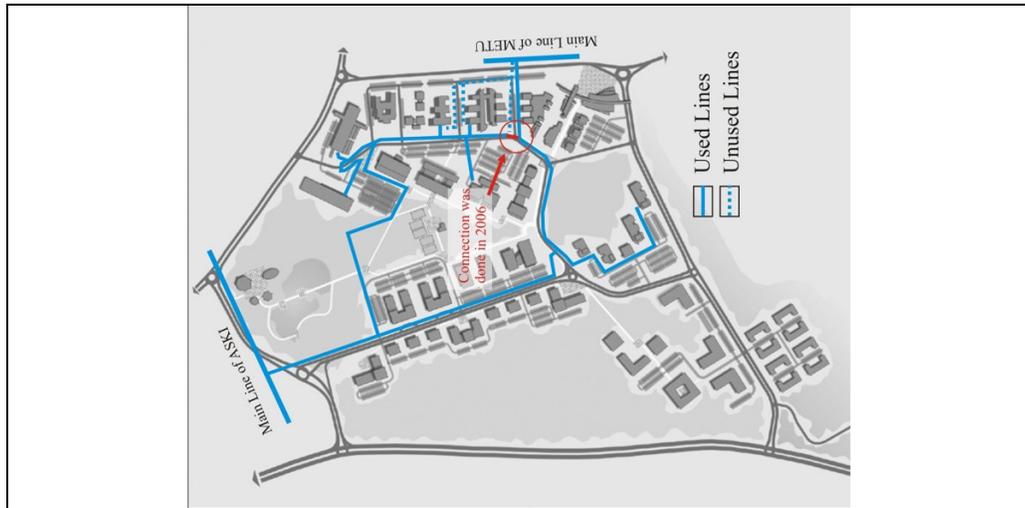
Water System (Source: Archive of Teknopark Inc.)
